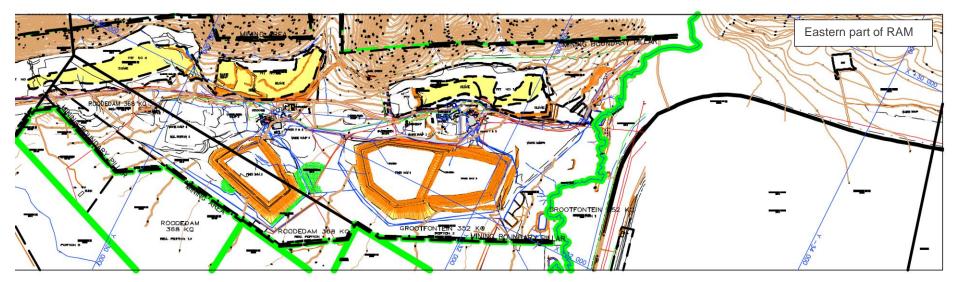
Site layout plan of already existing RAM, this plan has been divided into two parts for easier interpretation (plan attached as Addendum 1D)
